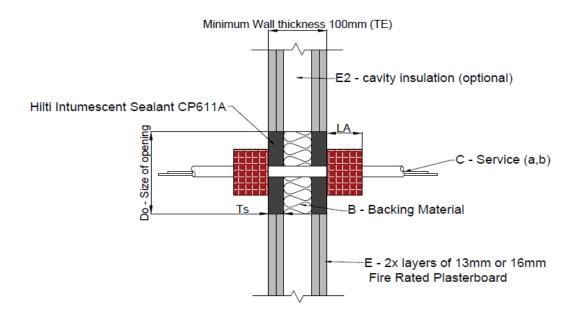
Steel Conduits ≤16mm, with additional protection, refer to table 10
